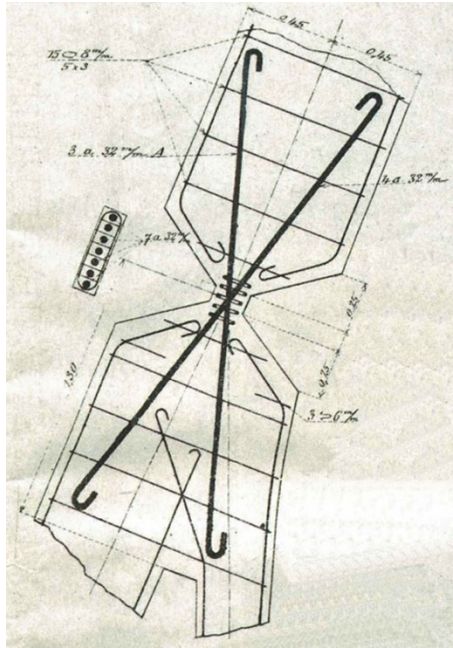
Ecausseville airships hangar. Structural detail of the hinges (Espitallier, 1919)
